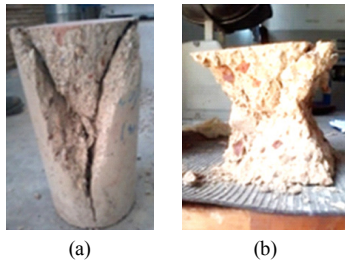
Observed failure patterns of the specimens: (a) Observed crack similar to cone and split crack, (b) observed crack similar to non explosive
